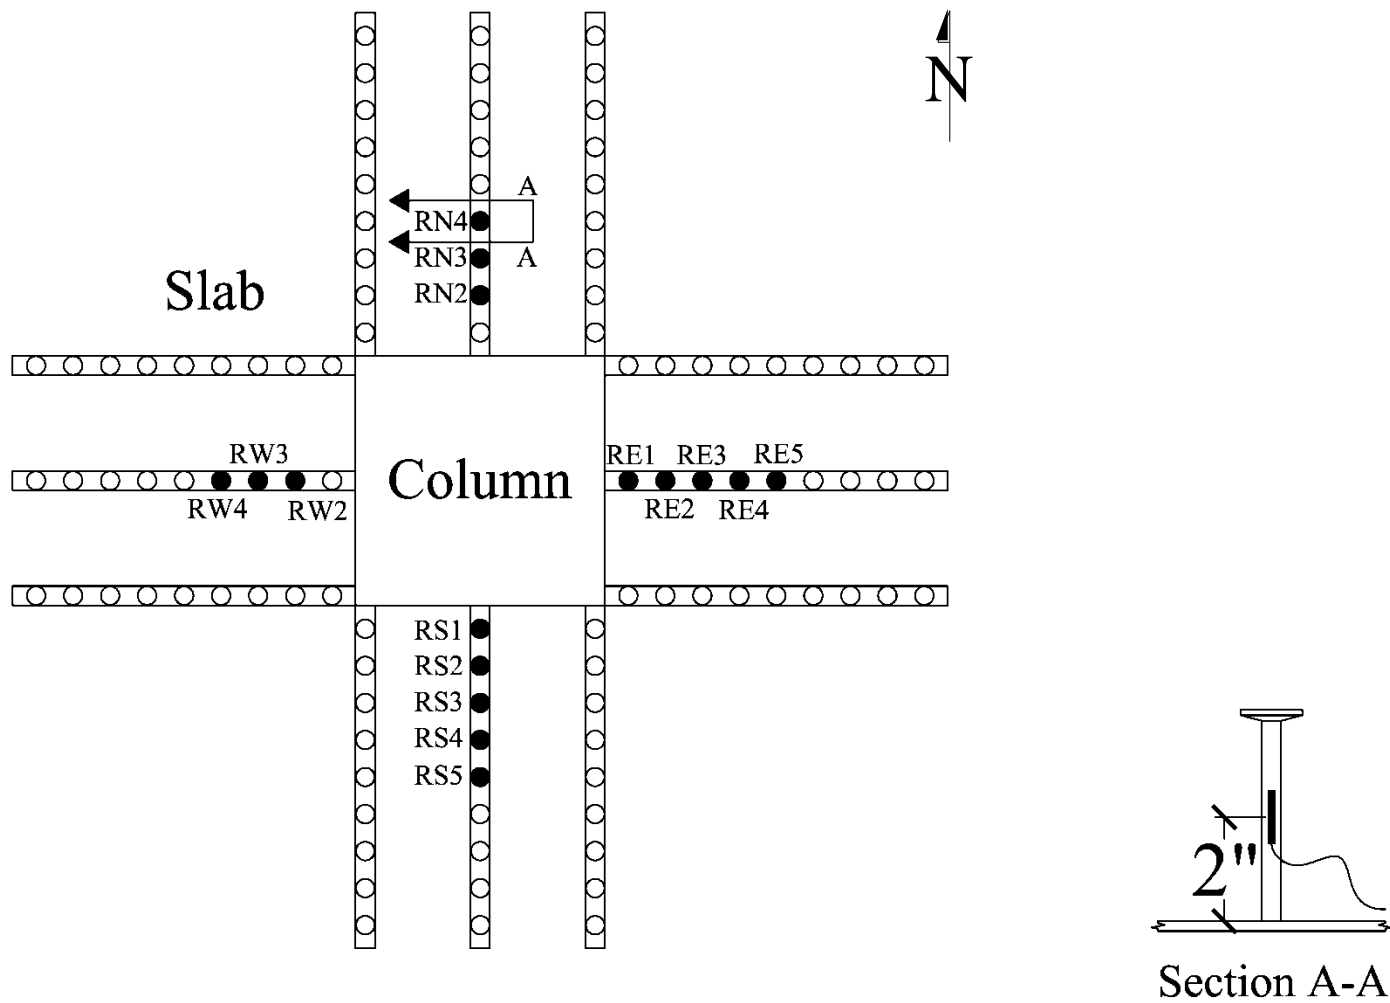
Specimen B1 Strain Gauge Layout for Shear Studs
